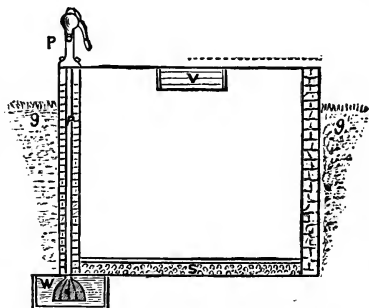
Vertical Section of Ice apartment or Basement—P, Blunt's Pump; P, Pump Pipe, 3 inches diameter; V, Ventilator on each of four sides; S, small stones for drainage; g g, Surface of Ground; W, Well under wall.
